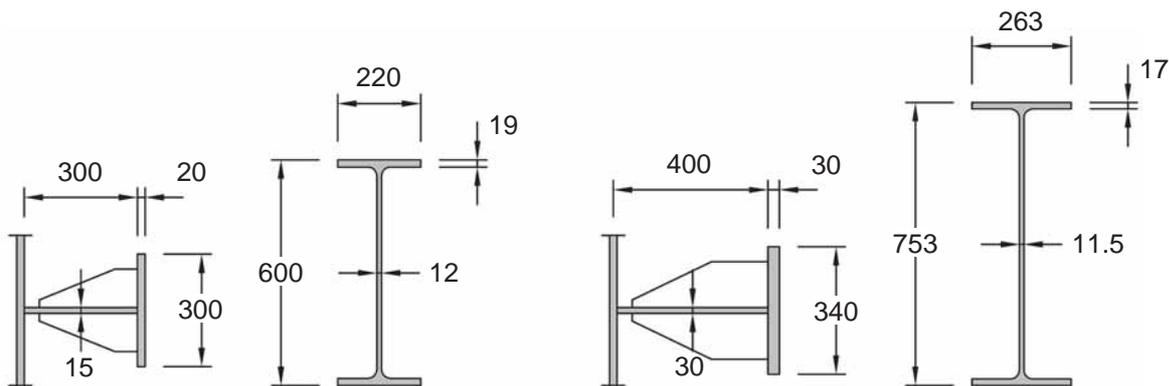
Non-strengthened transverse cross-bracing in span. Dimensions in [mm].
